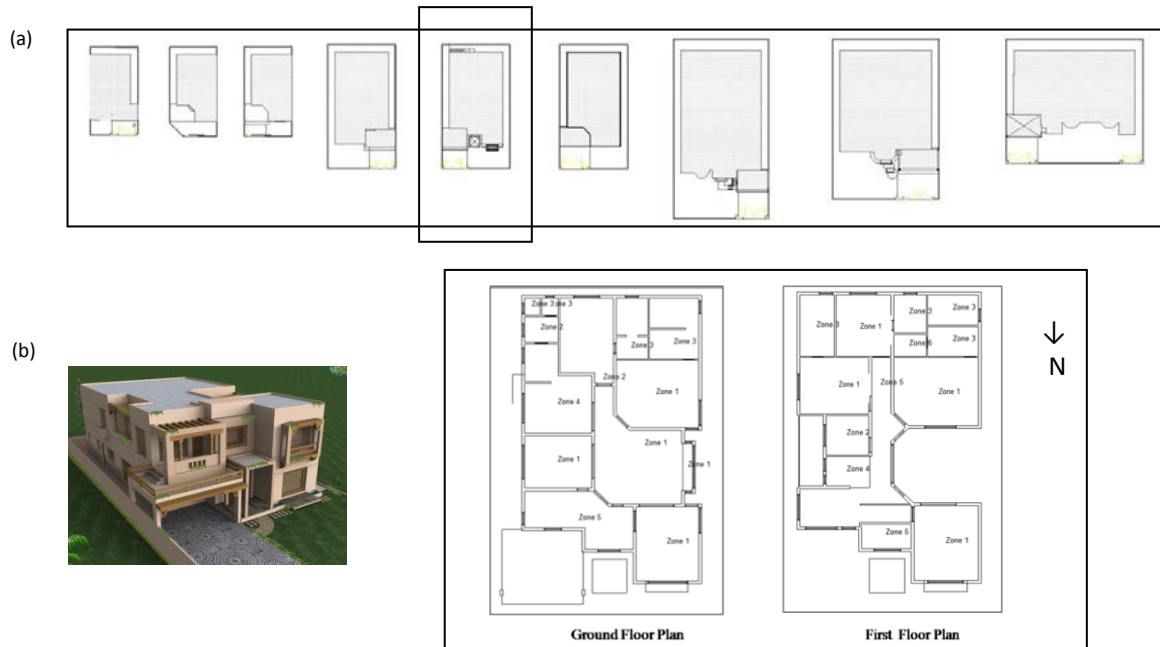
(a) Building footprint of randomly selected existing residential buildings within DHA limits. Prototypical residential unit used for modelling purposes highlighted. (b) 3D model and floor plans of selected residential building.
